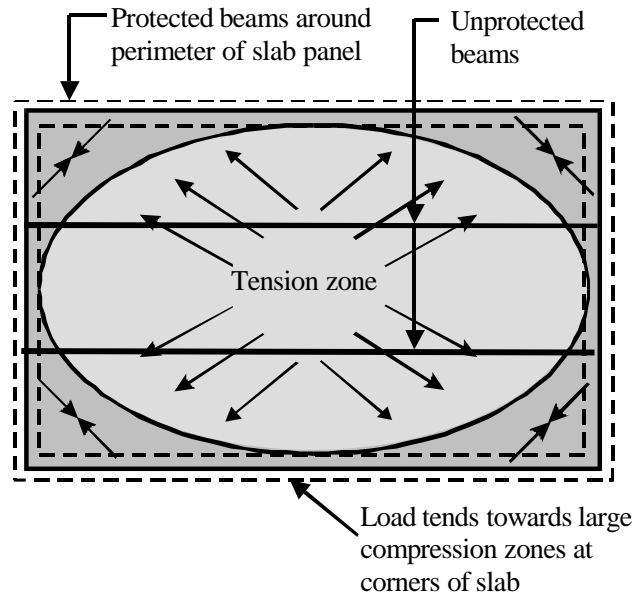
Postulated load distribution onto supporting beams due to membrane action in the slab
